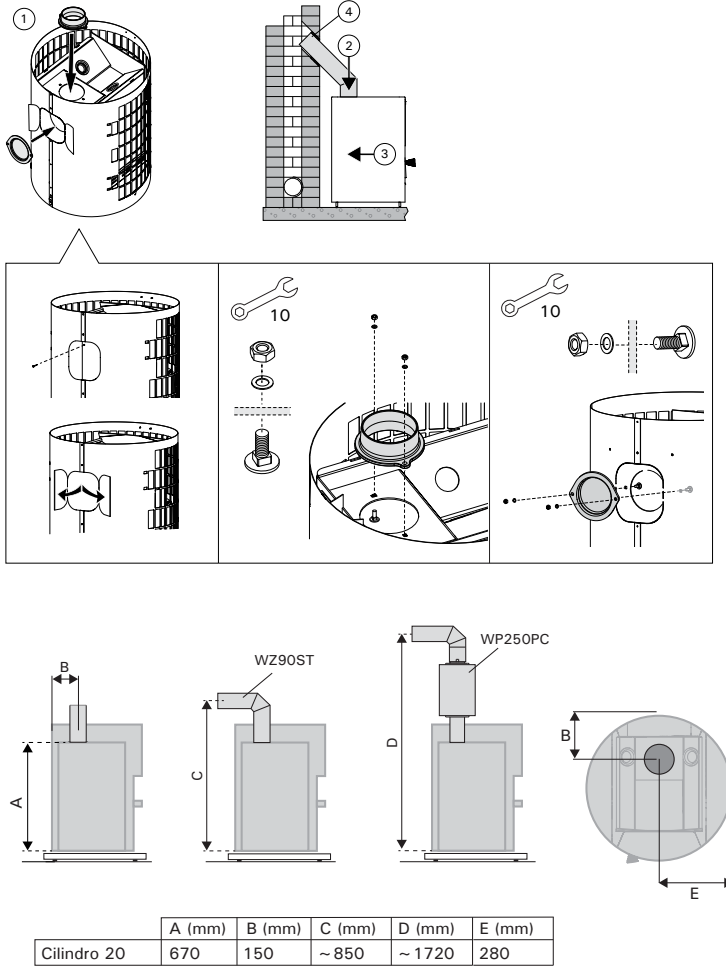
Connecting the sauna heater to a masonry flue through the top opening.
